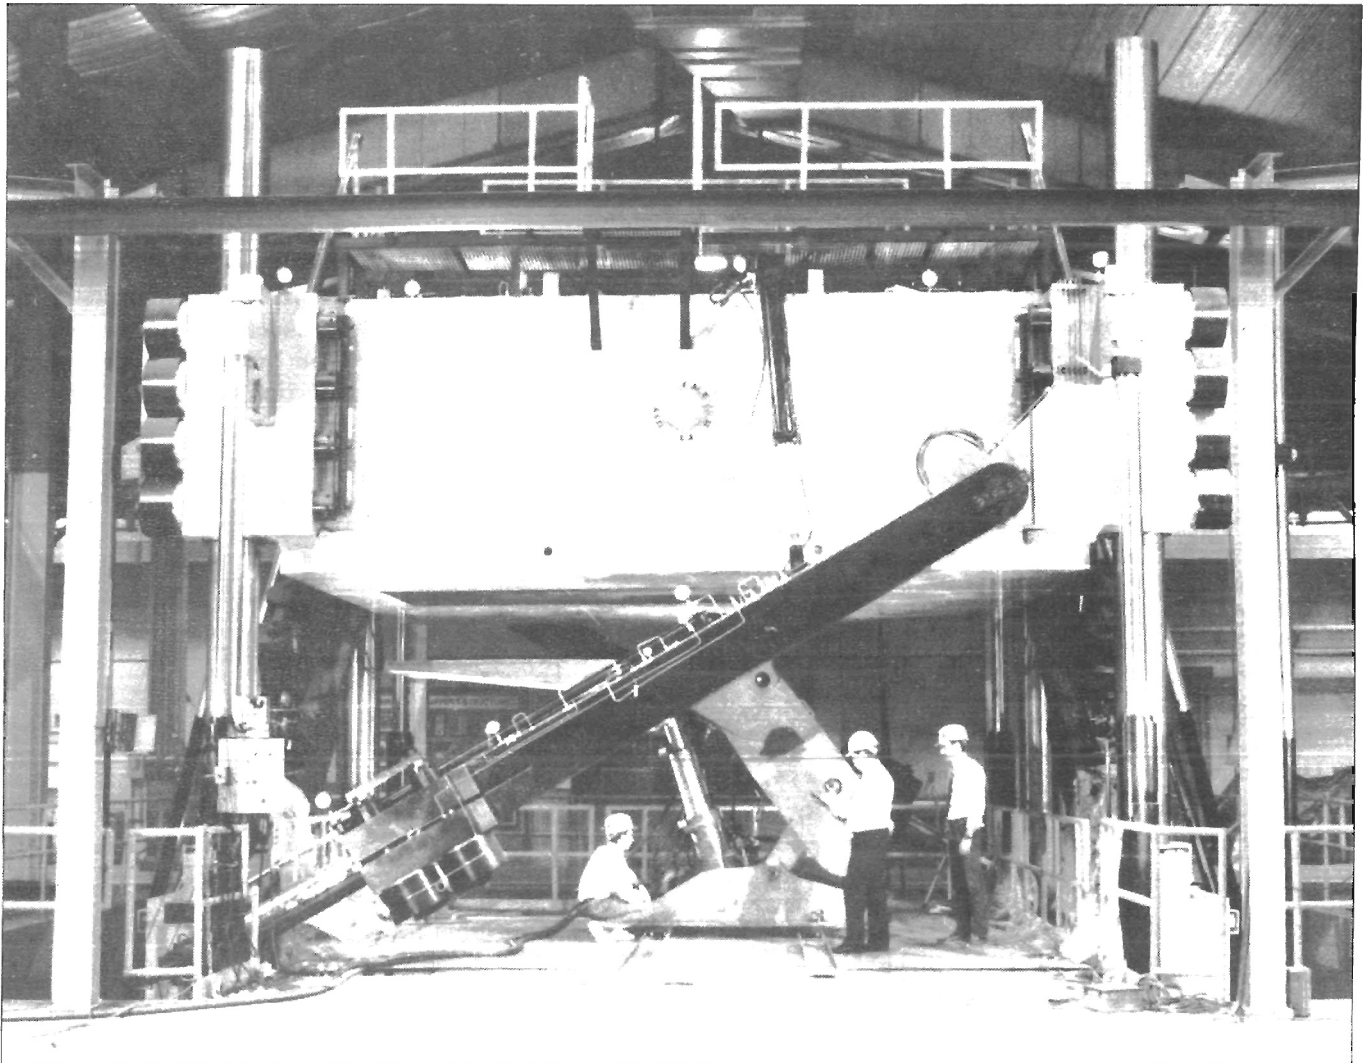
The USBM's Mine Roof Simulator. (Photo shows testing of a longwall shield.)
